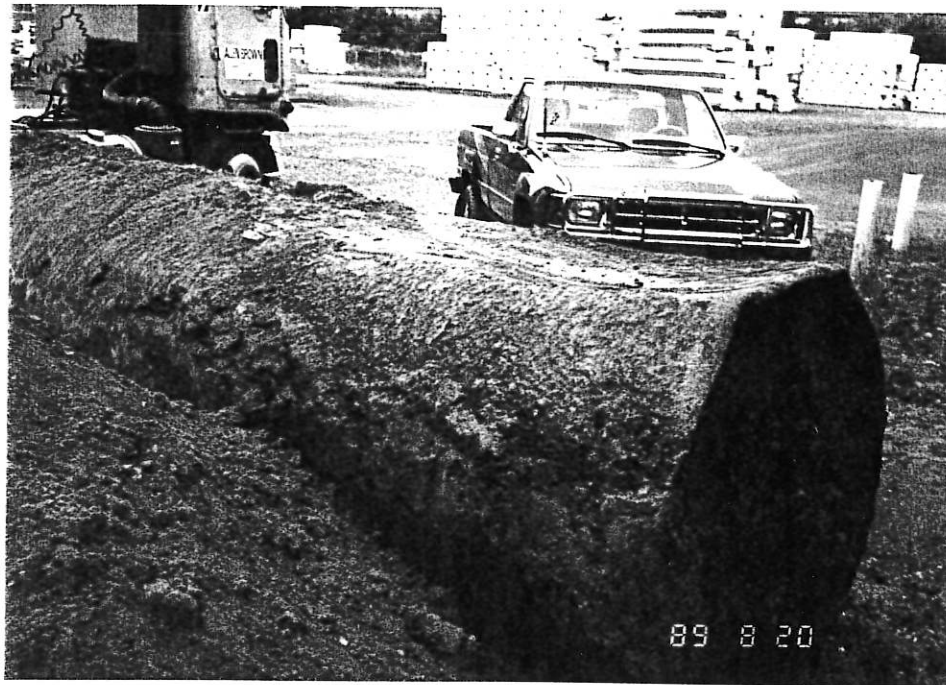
End view of UST no. 9 after removal from the tank pit.
